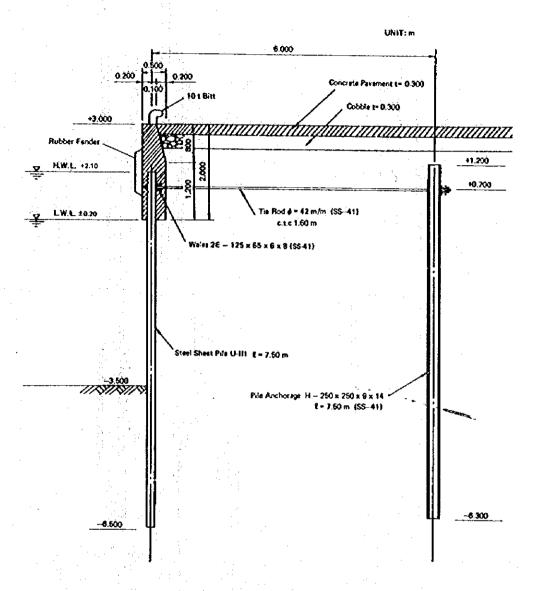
Typical Section of Small Crafts Wharf (Ibeno)
